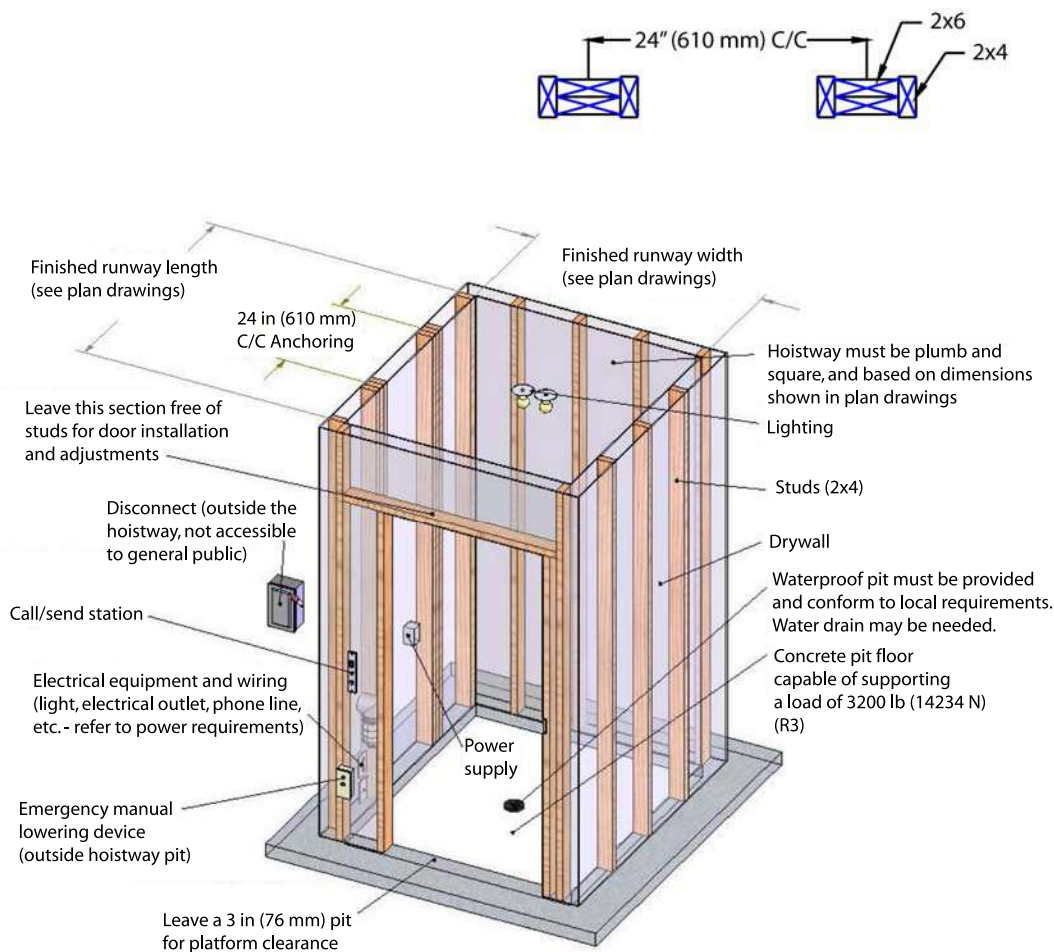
illustrates the recommended steps for constructing a wooden hoistway.
